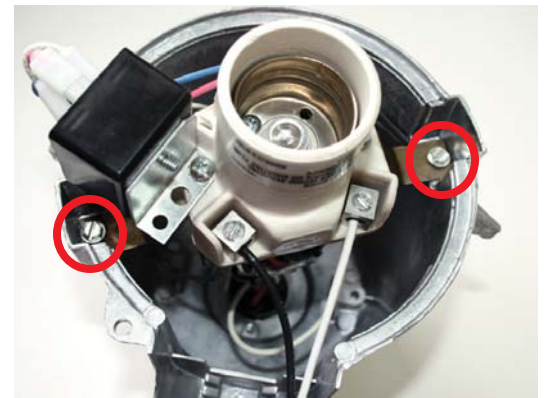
Remove the two screws that secure the socket, ballast and starter to the housing.
